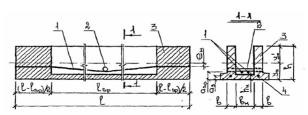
Locally prestressed main sprung type beam of prefabricated monolithic reinforced concrete floor:
